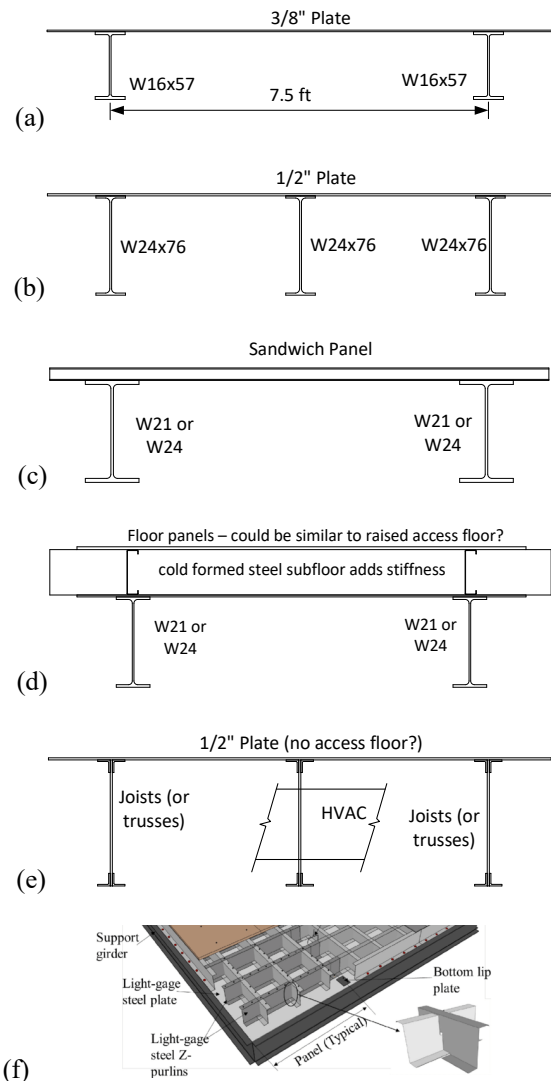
Examples of all-steel floor module concepts considered in Phase 1 (a) two beams and plate in double tee configuration with raised access floor (RAF) (not shown), (b) three beams and a plate with RAF, (c) two beams and a sandwich panel (or cellular panel) with RAF, (d) two beams with CFS framing instead of RAF, (e) open web steel joists with plate and no RAF, (f) two-way system of [5]
